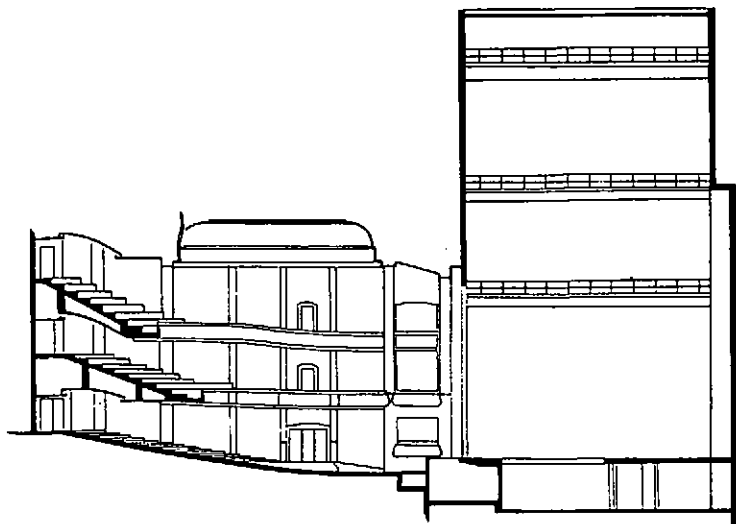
Longitudinal section of the completed Princess of Wales Theatre.
